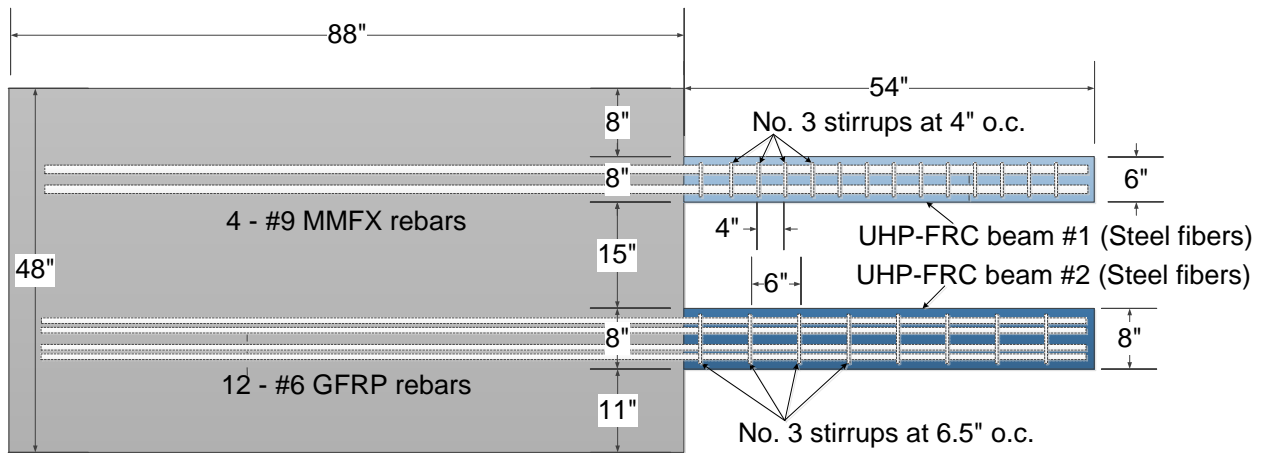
3 Detailed side view of the specimen showing specimens UHP-FRC #1 and #2
